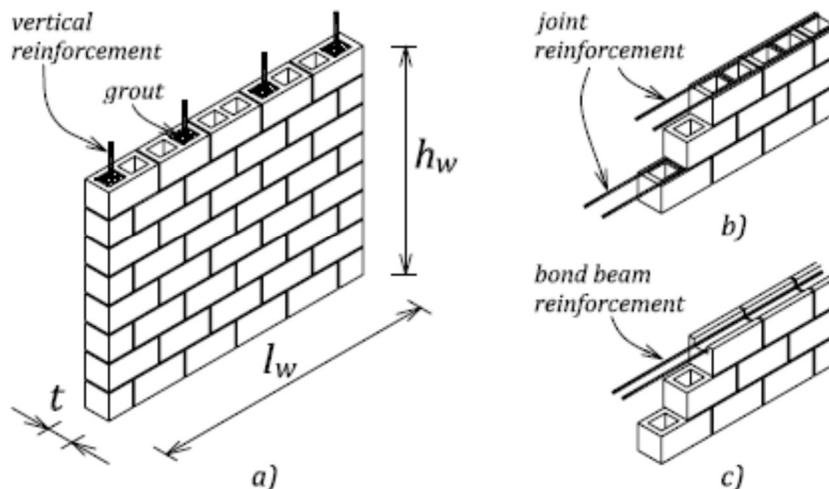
Typical reinforced concrete masonry block wall: a) vertical reinforcement; b) joint reinforcement; c) bond beam reinforcement.
